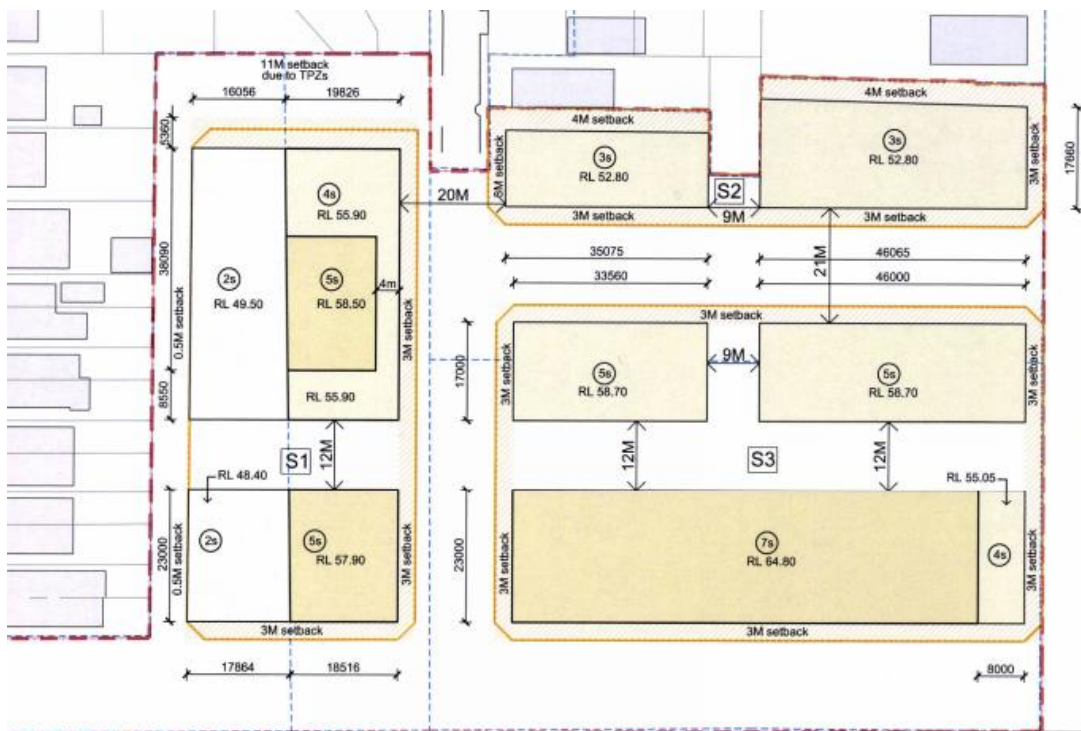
Approved building envelope plan, southern precinct containing development lots S1 (at left), S2 (at top) & S3 (at bottom)
